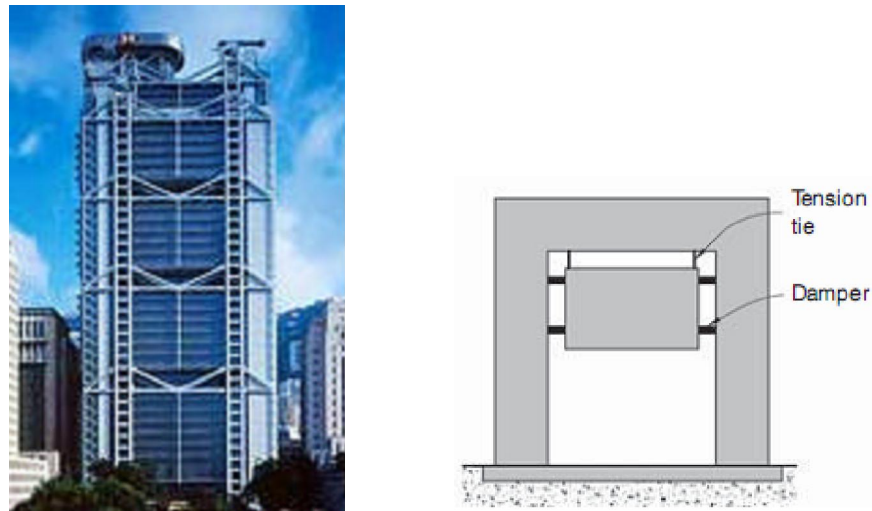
Bridge building with suspended floors; and Hong Kong and Shanghai bank building (left) schematic figure (right) (Charleson 2009)
